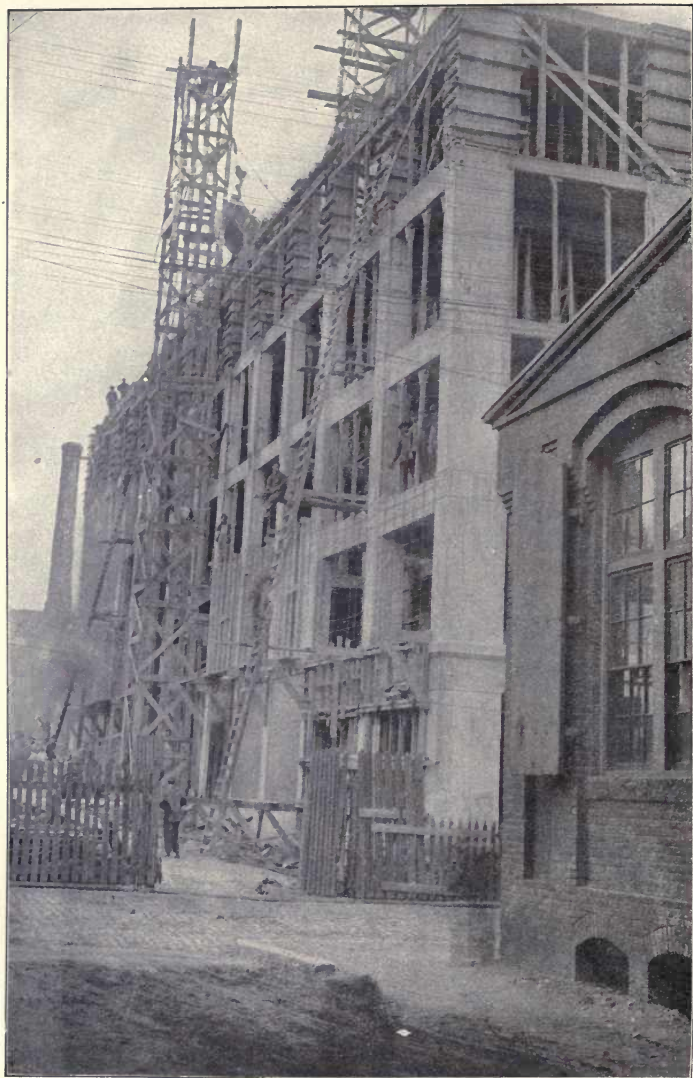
Lynn Storage Warehouse at Sixth Floor Level. (See p. 82.)
